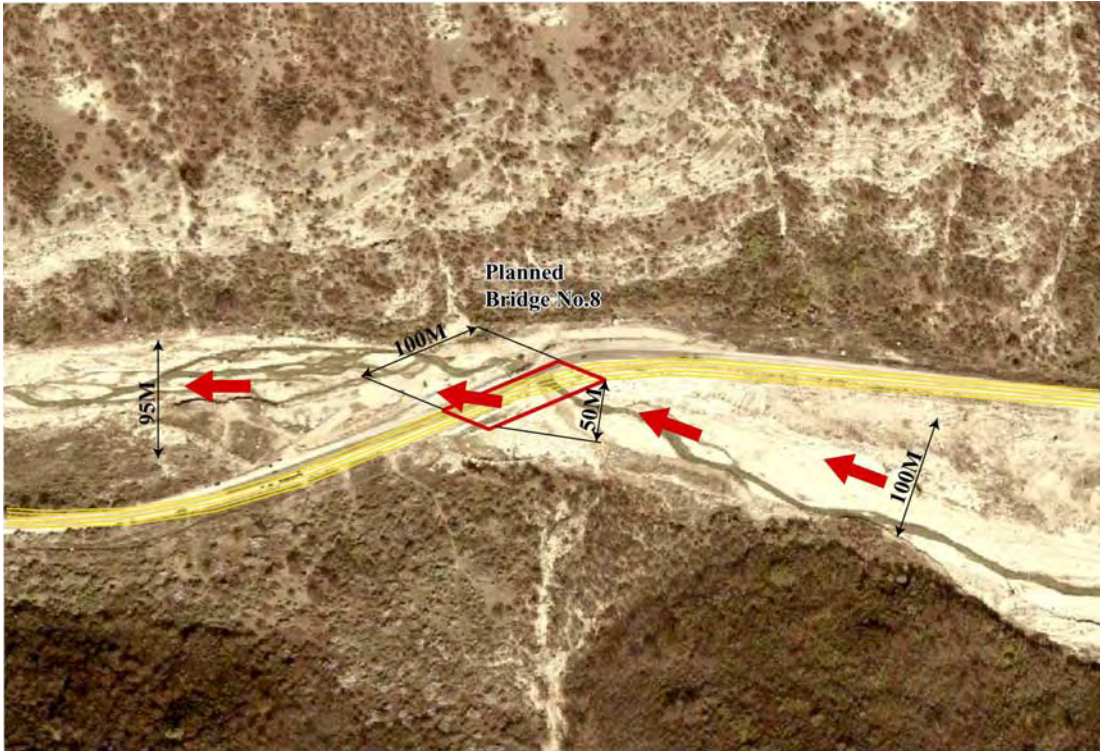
Satellite Image with Road Plan (Location of Planned Bridge No.8)
